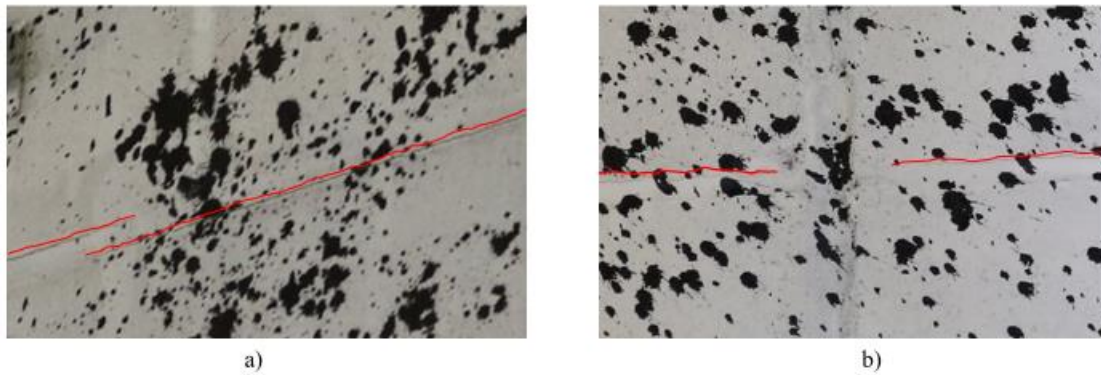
Horizontal cracking at the mortar joints near the midspan at 90% of the nominal reinforcement yield strain: a) Wall CH7800b; and b) Wall NH7800b
